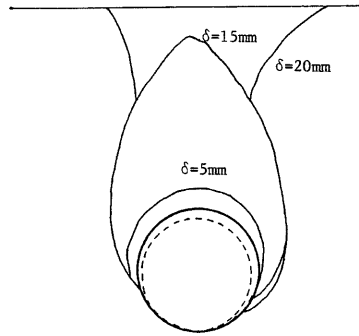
Development of loosened zone by model test of tunnel excavation, for low overburden.
